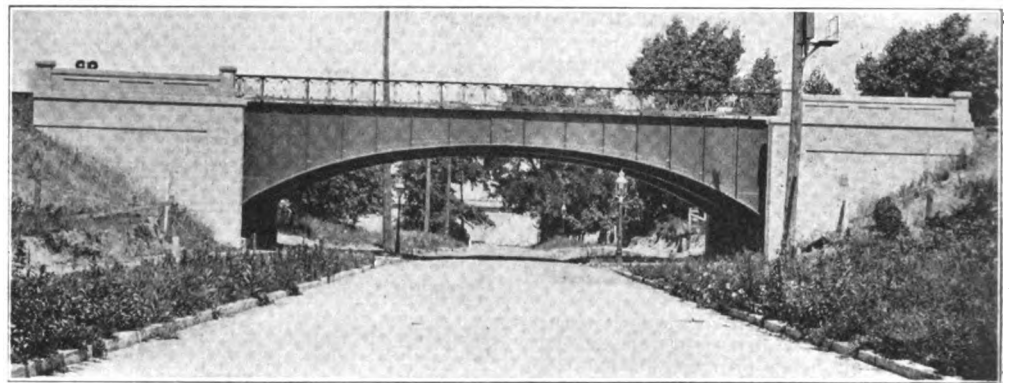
Three-Hinged Steel Arch at Eddy Road, Cleveland.
